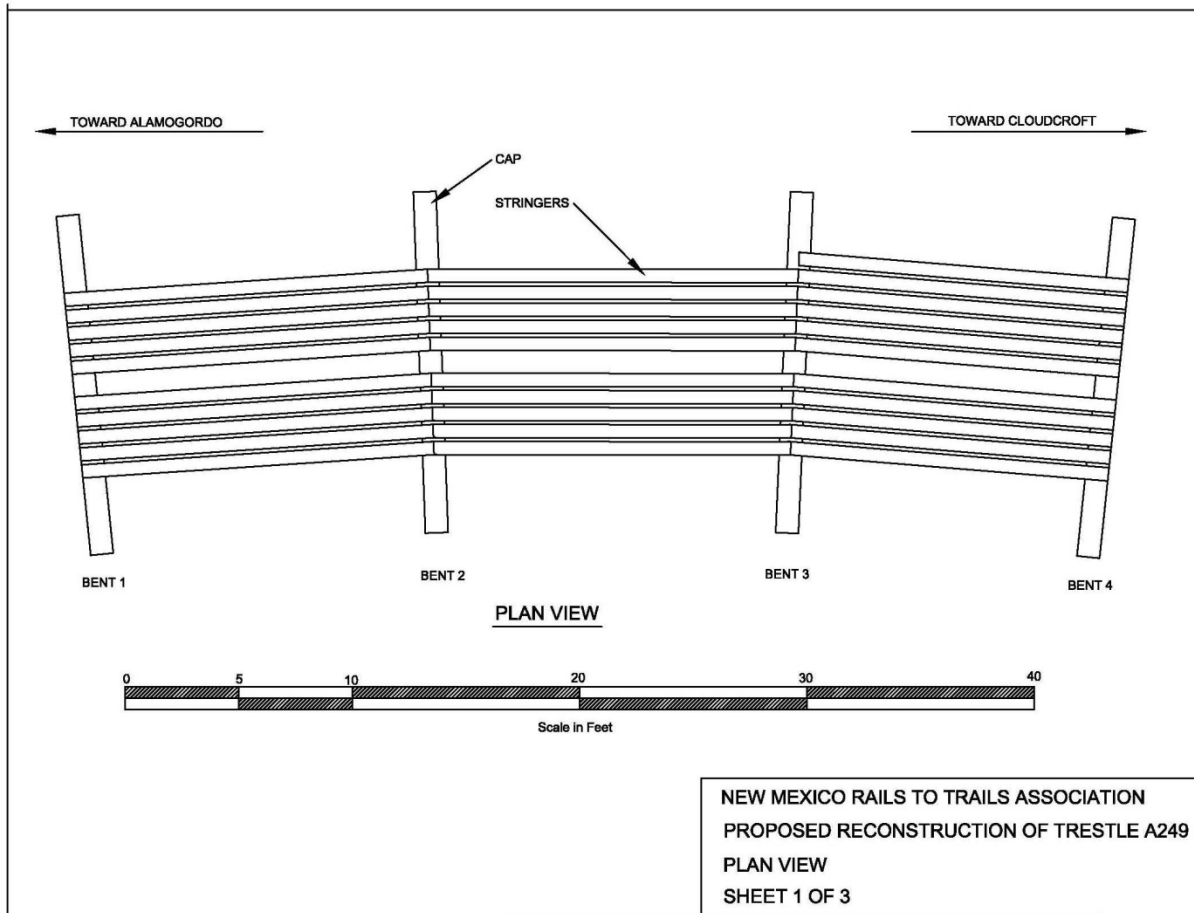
Proposed Reconstruction of Trestle A 249, Plan View.
